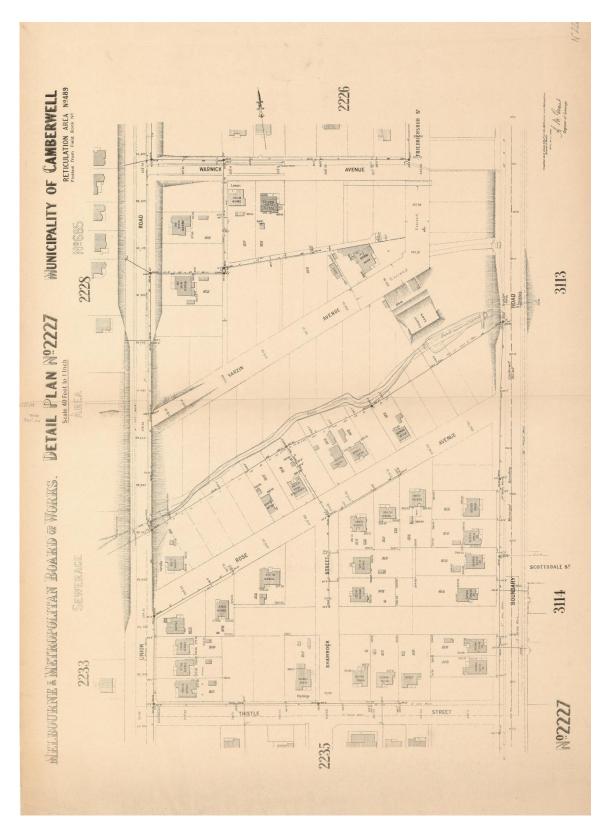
MMBW detail plan 2227, c. 1925, showing development in the precinct, north of Varzin Avenue. North is at top.
